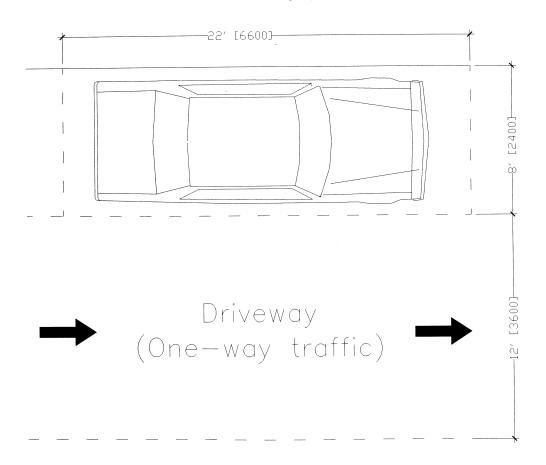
PARKING STANDARDS Parallel Parking Bay
